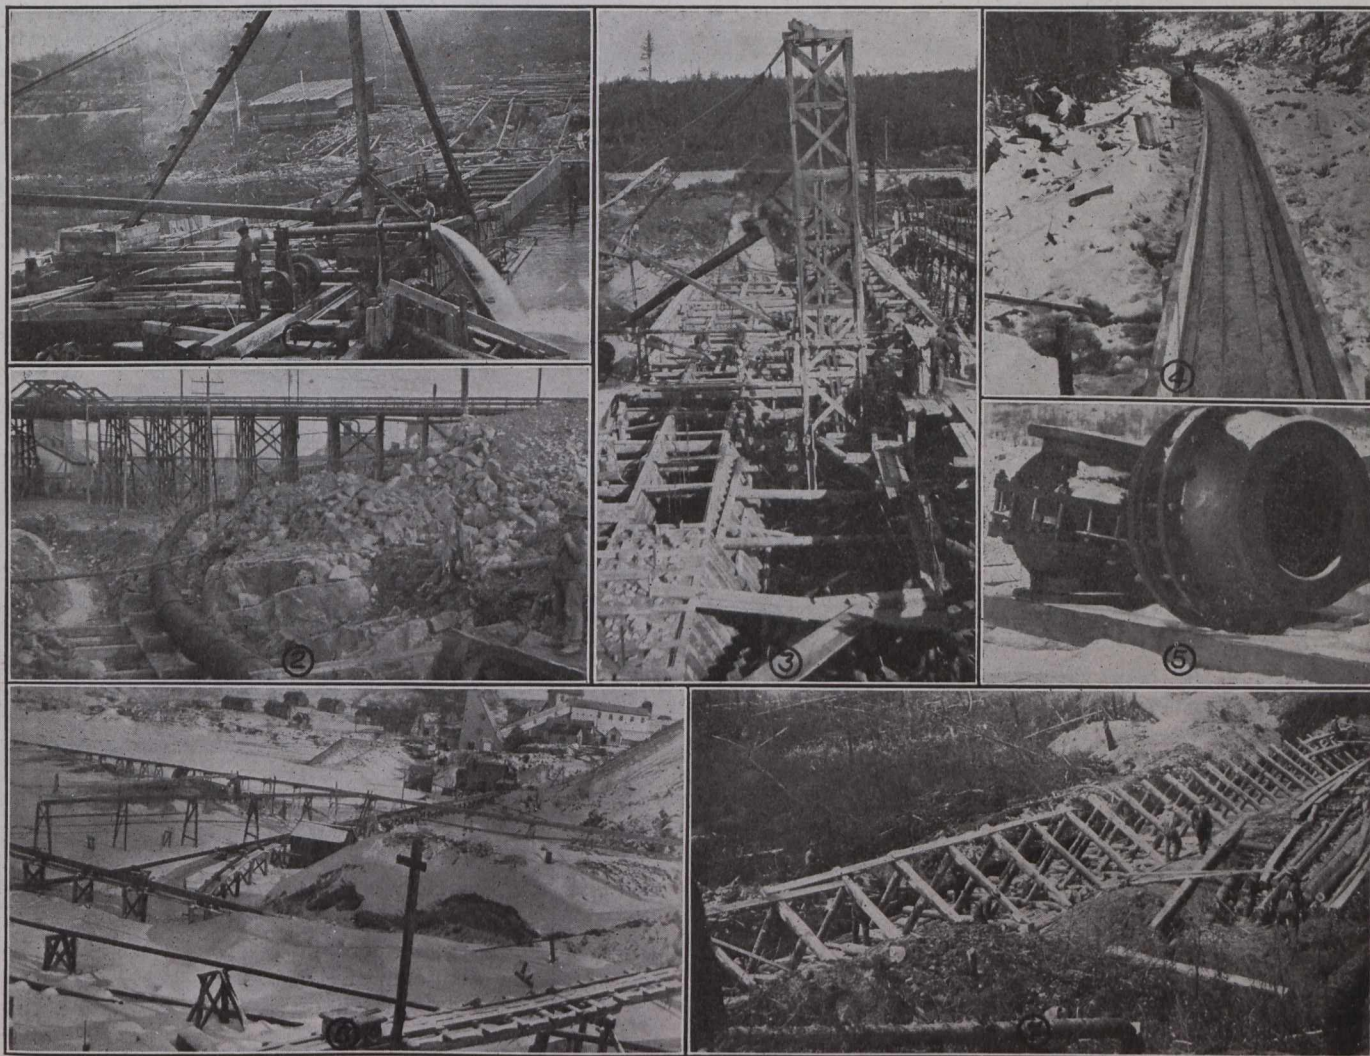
(1) Pumping out Cofferdam at Short Lake. (2) Wood Stave Pipe, carrying discharge from Cobalt Lake Drainage Pumps. (3) Short Lake Dam under construction. (4) Flume from height of land to Brief Lake. (5) Flexible Couplings. (6) Pipe Lines from Short Lake to concentrating mills. (7) Timber Dam at South Pickerel Lake.
